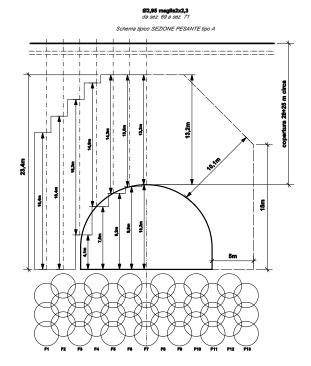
Drawing of the consolidation from the outside with JET GROUTING to eliminate the breakthrough.
